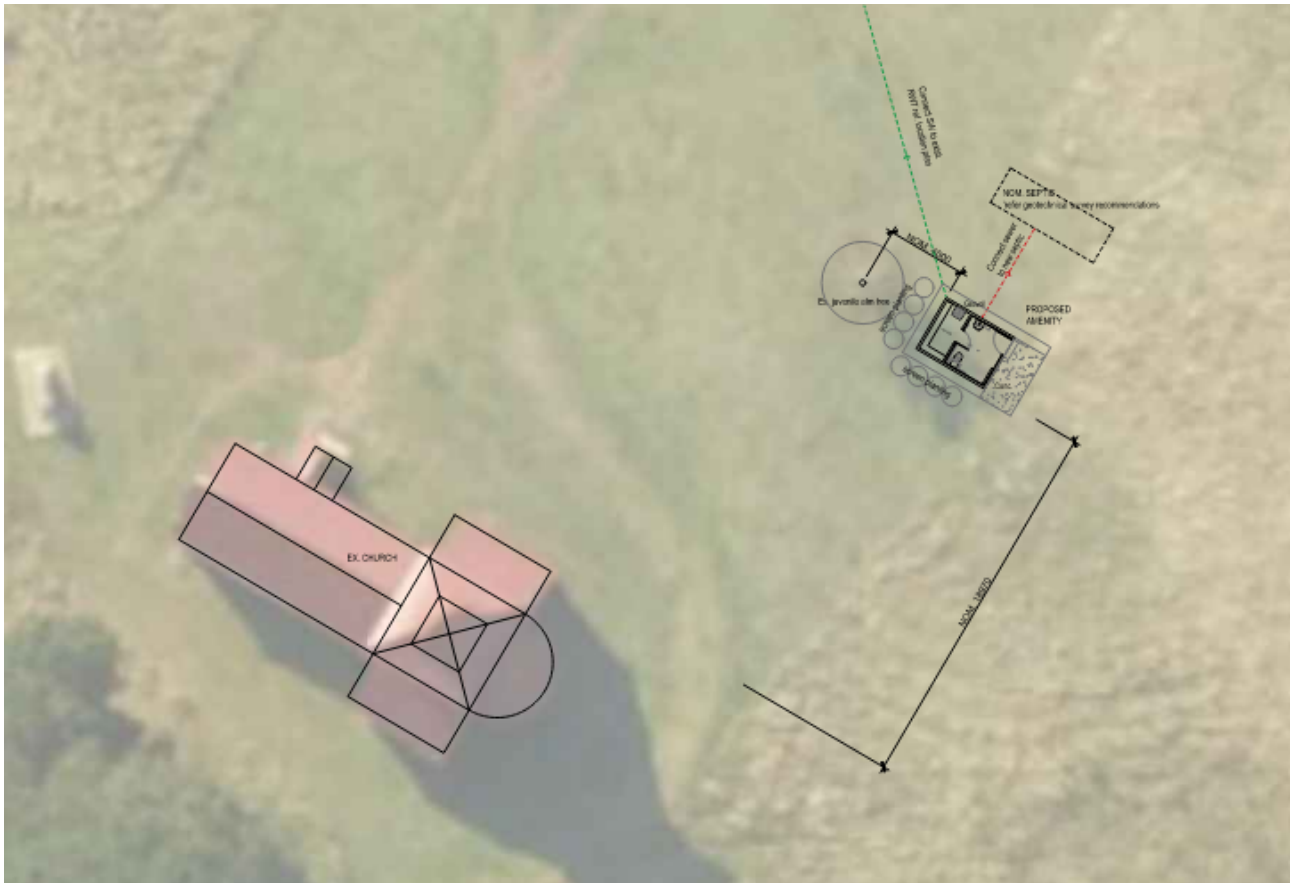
Excerpt of the site plan showing the location of the proposed amenity building relative to the existing church building and site features (Source: Application Documents).
